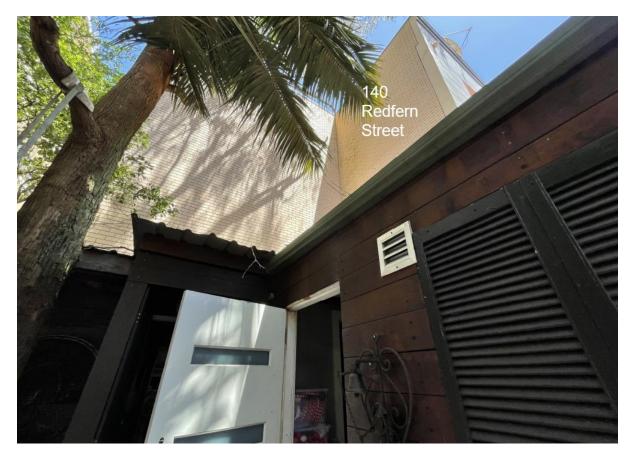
Scale of adjoining building (140 Redfern Street) viewed from rear yard
